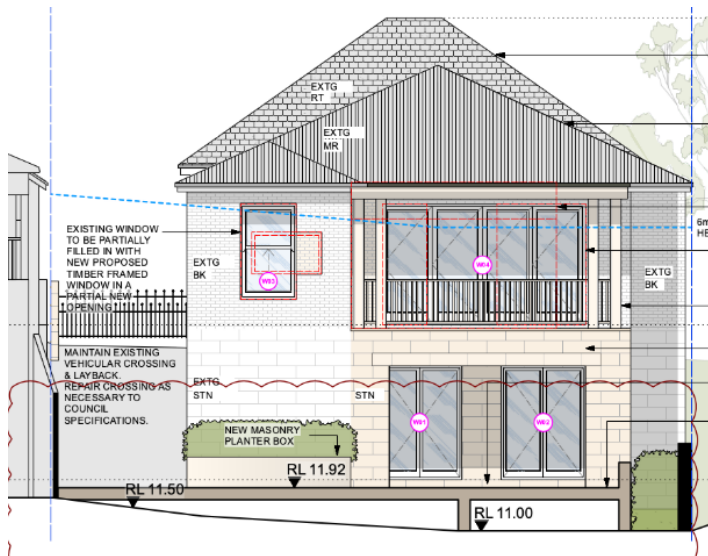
Proposed north-west (rear) elevation – Dwelling 1 at ground floor, Dwelling 3 at lower ground floor
